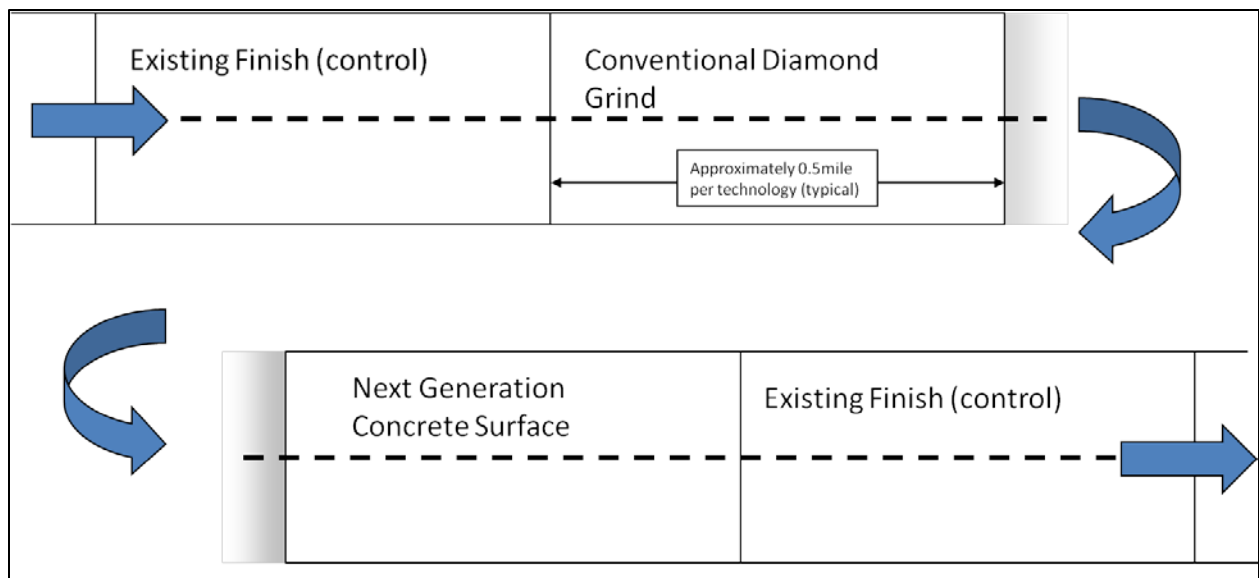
Plan View of Quiet Concrete Demonstration Project.
